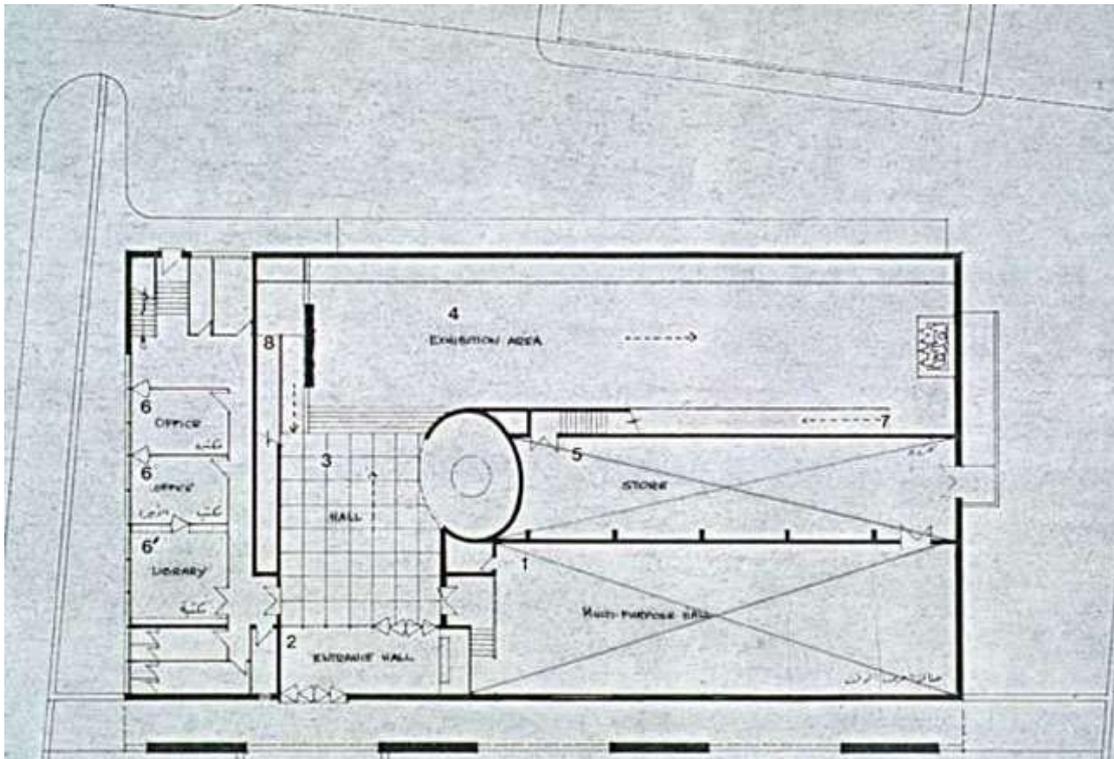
Plate XVI Showing the floor plan layout of Luxor Museum Egypt.
